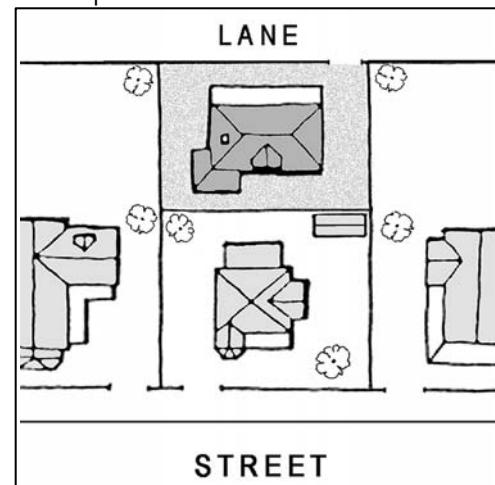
good example of subdivision & infill, retaining setting of existing building.
